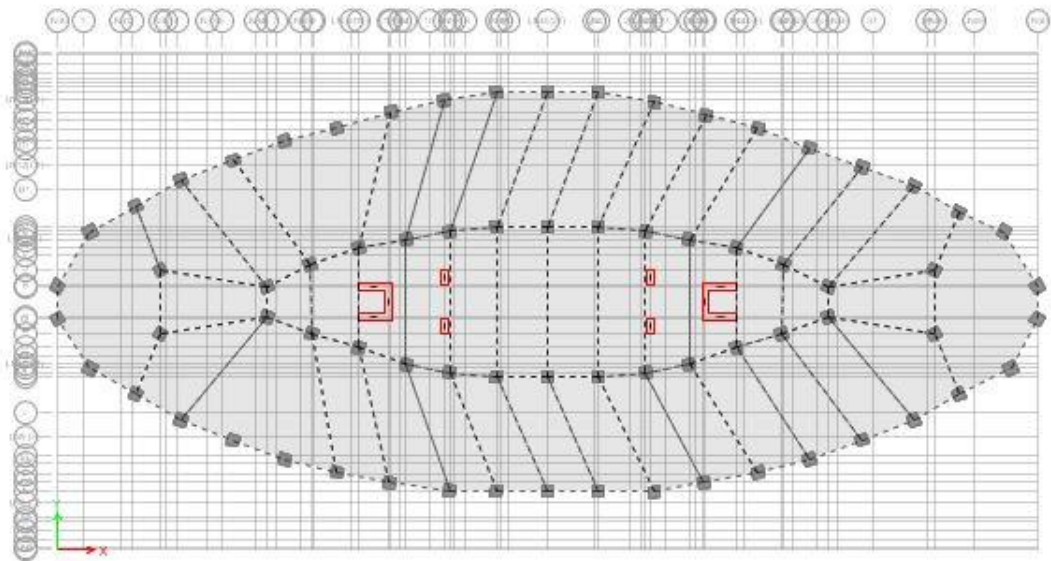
Axial force on the concrete columns- Dead Load factor of 1- ETABS
